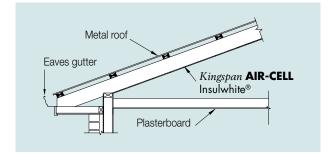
Side elevation of *Kingspan* AIR-CELL Insulwhite[®] in a pitched metal roof retrofit (attic conversion)
